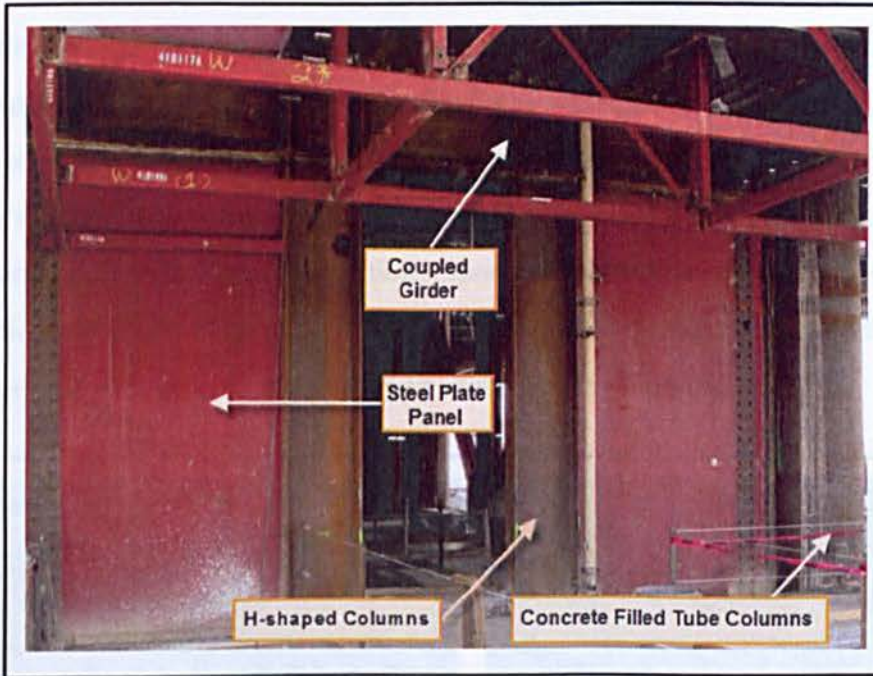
Coupled SPSW under construction regarding to 24-storey US Courthouse Building, Seattle, Washington
